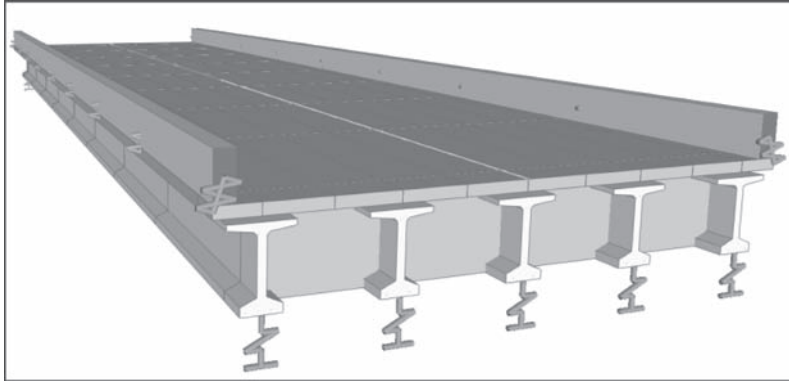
Final model of Rollins Road Bridge in SAP2000®.
